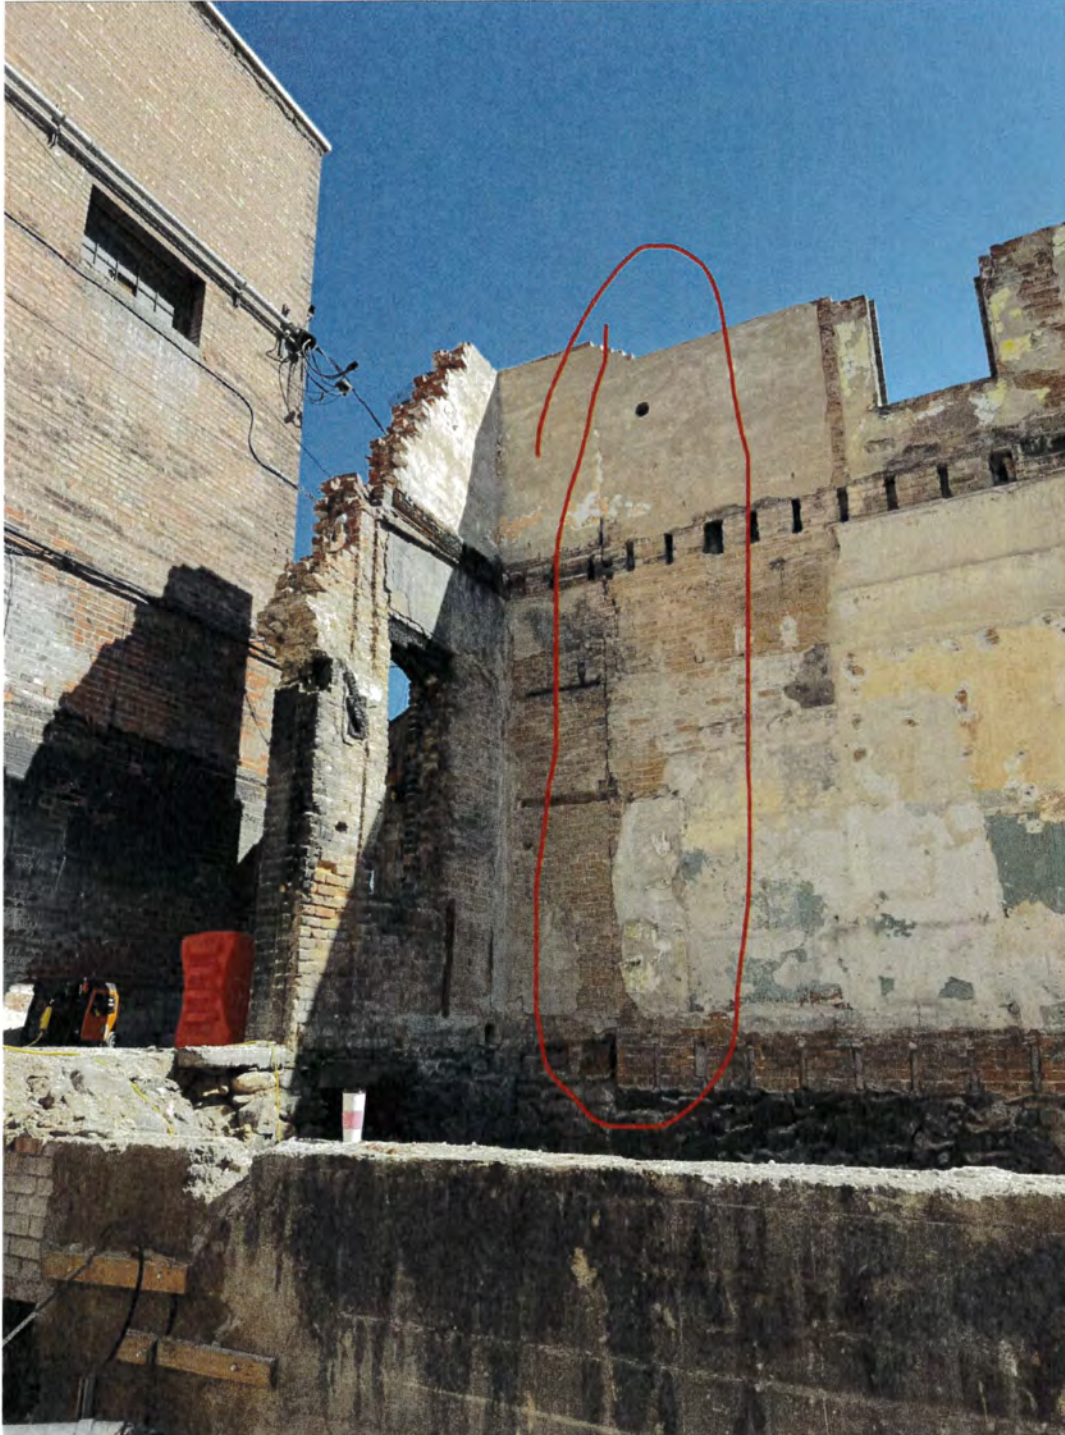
Site view with red markup identifying the wall segment to be removed and replaced with non-structural concrete infill.
